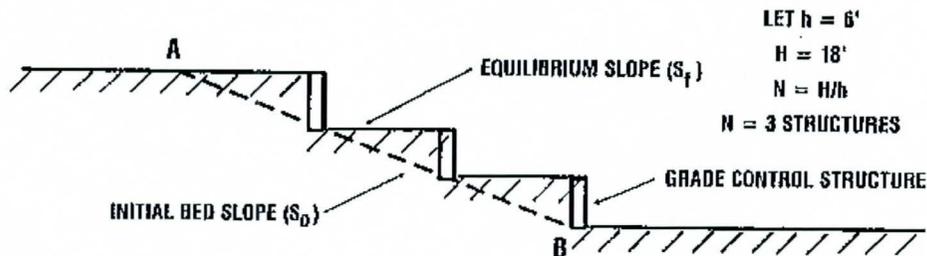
Stabilization of degradational zone using three hydraulic control structures. Each structure has a design drop of six feet.
